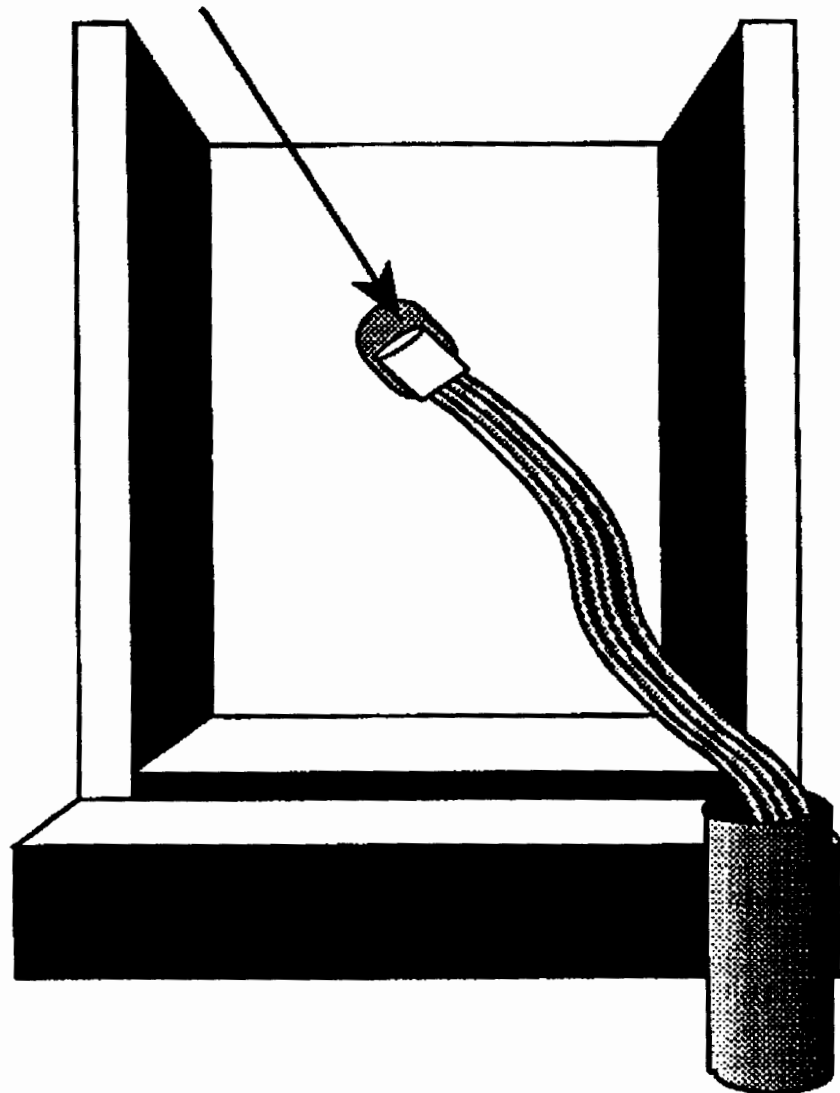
CONNECTION OF EARTH ELECTRODE RISER TO STRUCTURAL COLUMN
